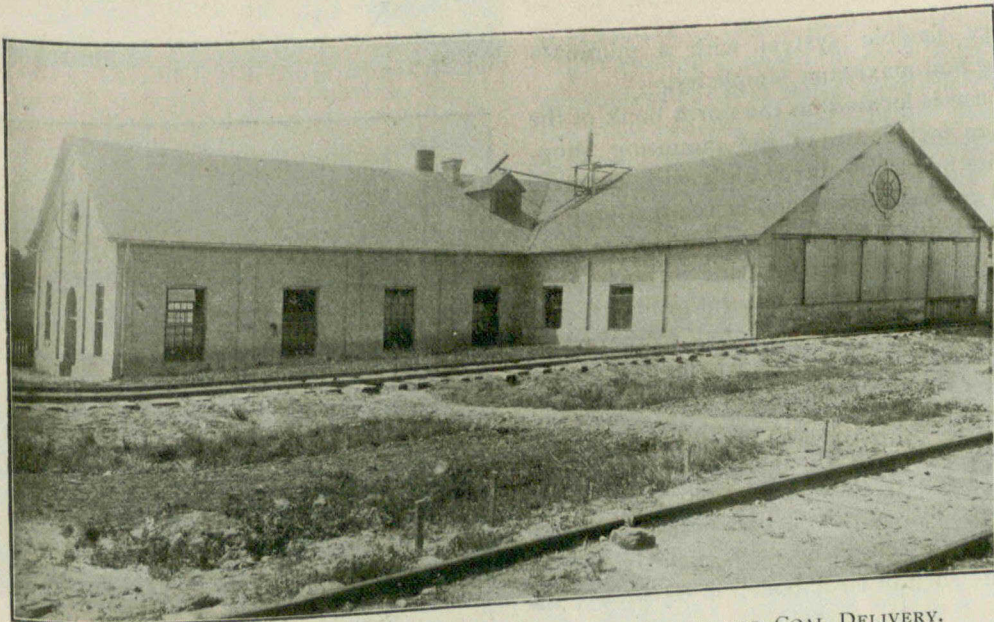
VIEW OF POWER HOUSE, SHOWING RAILWAY SIDING FOR COAL DELIVERY.
